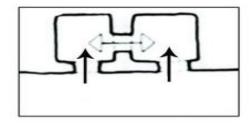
Schematic cross-section and plan of a horizontal dwelling [14]
